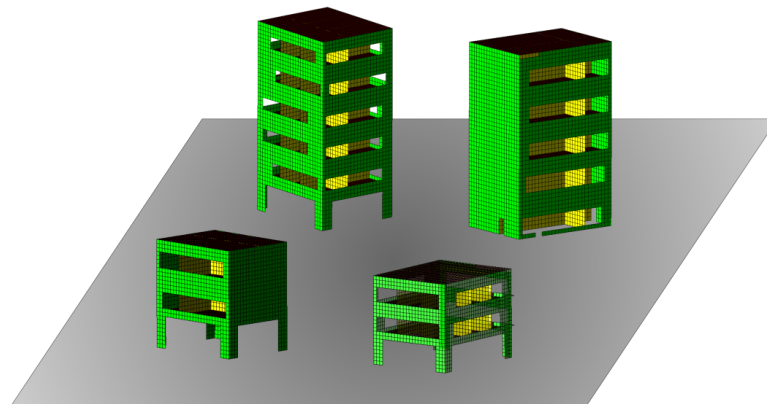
A generated portfolio of steel-concrete composite office buildings using the SBP-Tool
